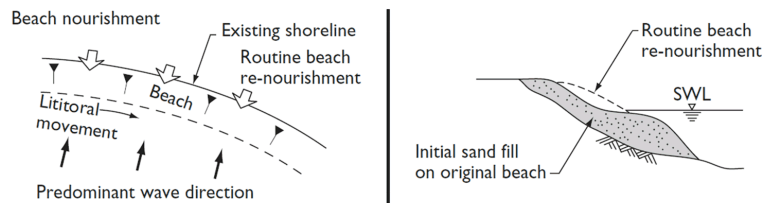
Typical plan view and cross section illustrating beach nourishment.
